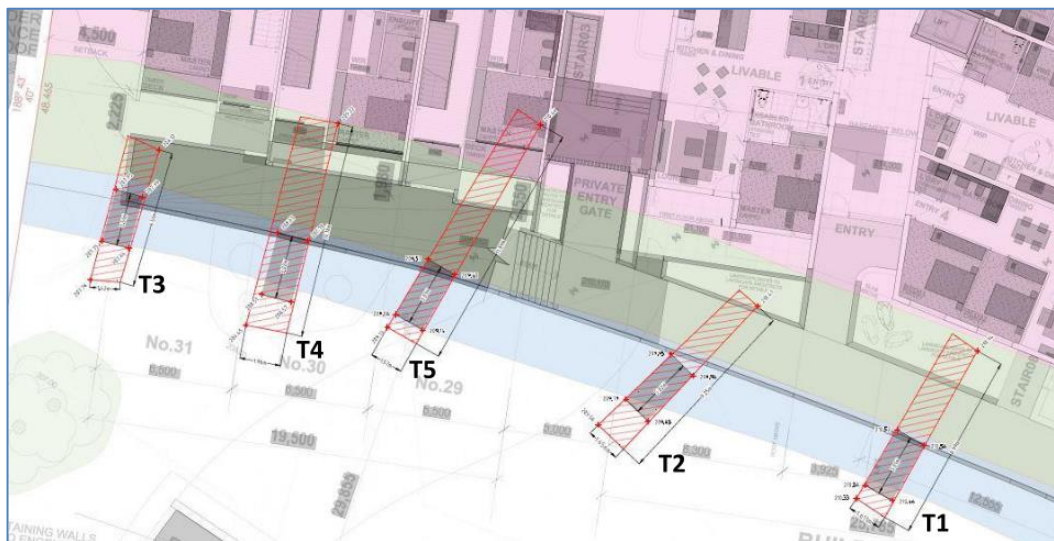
Survey plan of five trenches (taken from Heathcote Hall Driveway Testing Results, prepared by Casey and Lowe, September 2018)
